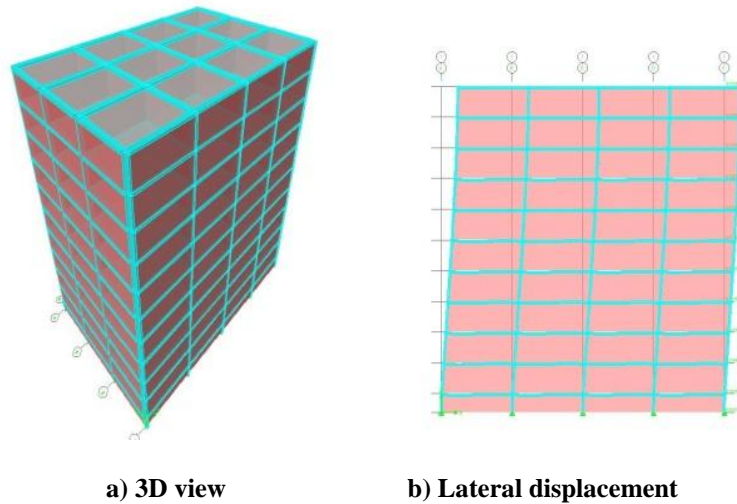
Model 3: G+10 RC building of full infill wall with slab element
